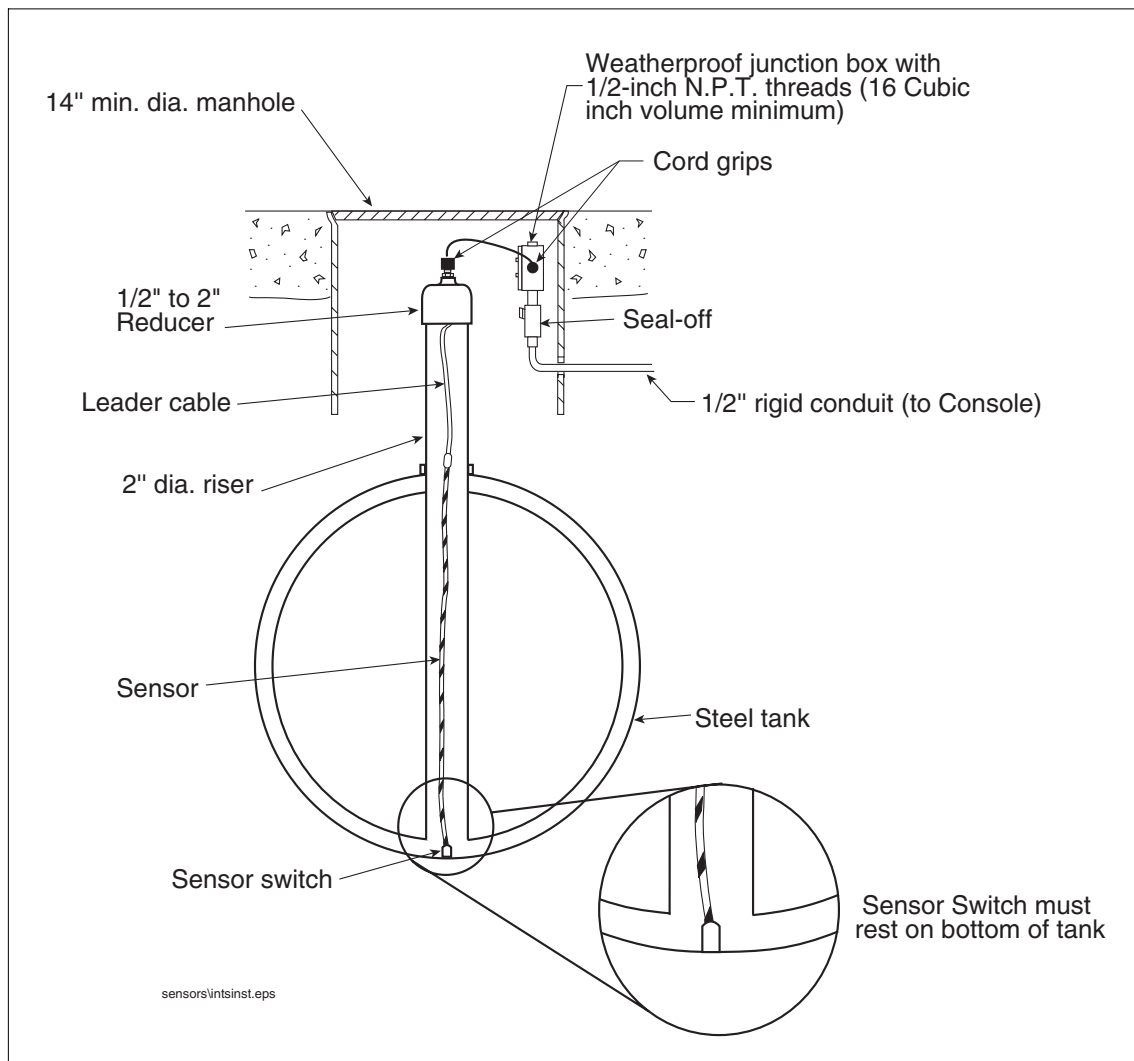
Sensor Dimensions and Installation Requirements - Steel Tank
